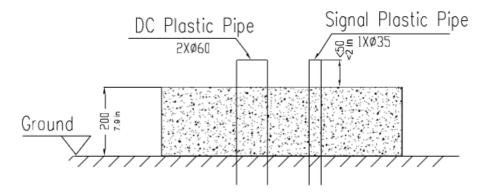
Slim Line Dispenser Concrete Foundation View
